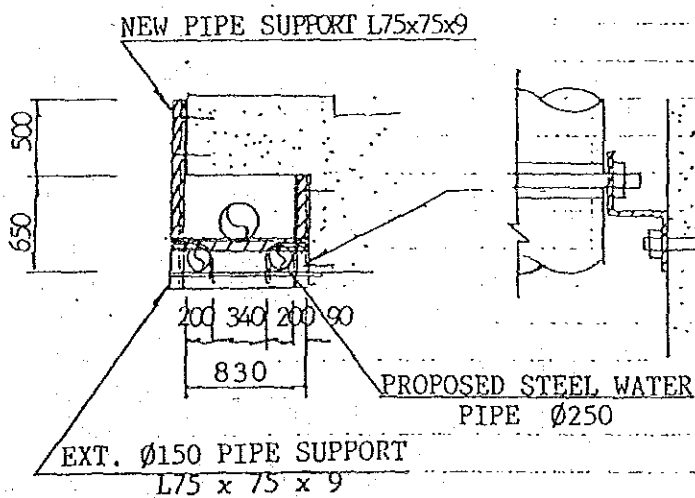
WATER PIPE LINE ALONG MALAKAL BRIDGE
